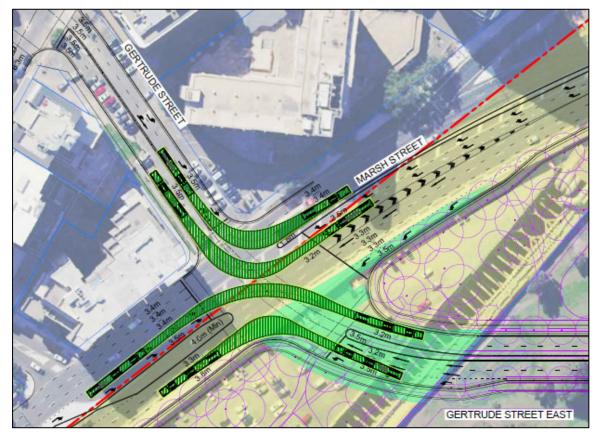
Intersection design – Marsh Street / Gertrude Street Source: Arup
